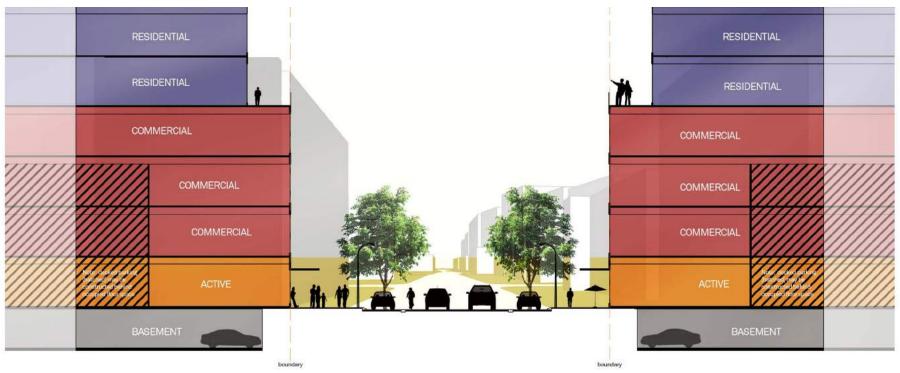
\_A typical cross section within the broader Midland West End precinct, showing building heights, setbacks, land use and street characteristics
